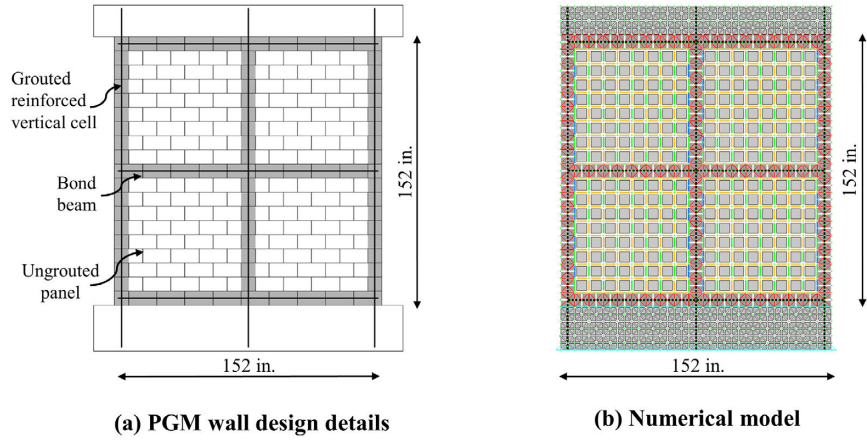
Design details and numerical model of a partially grouted reinforced masonry wall.
